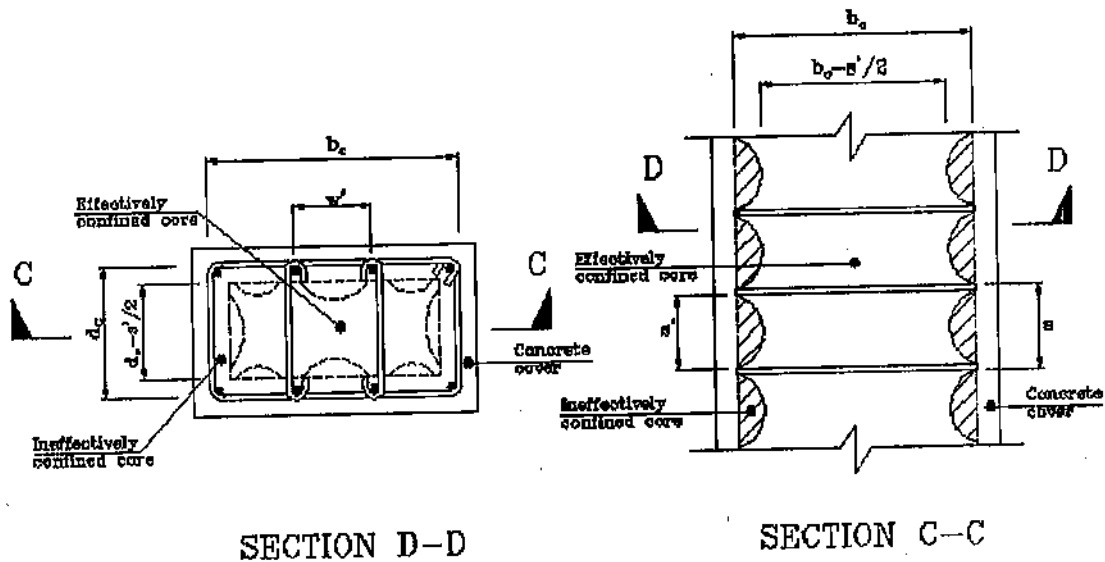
Effectively confined core for rectangular shaped reinforced concrete column.
